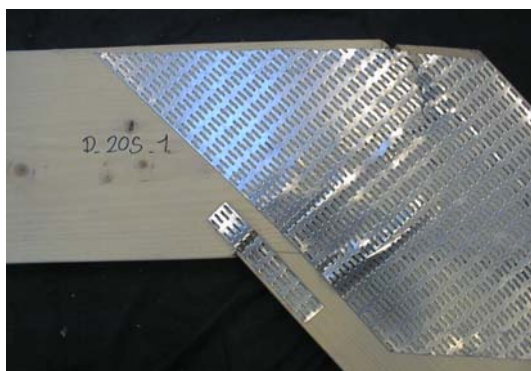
Tension failure in the nail plate between the outer leg and the rafter and buckling at the inner corner.
